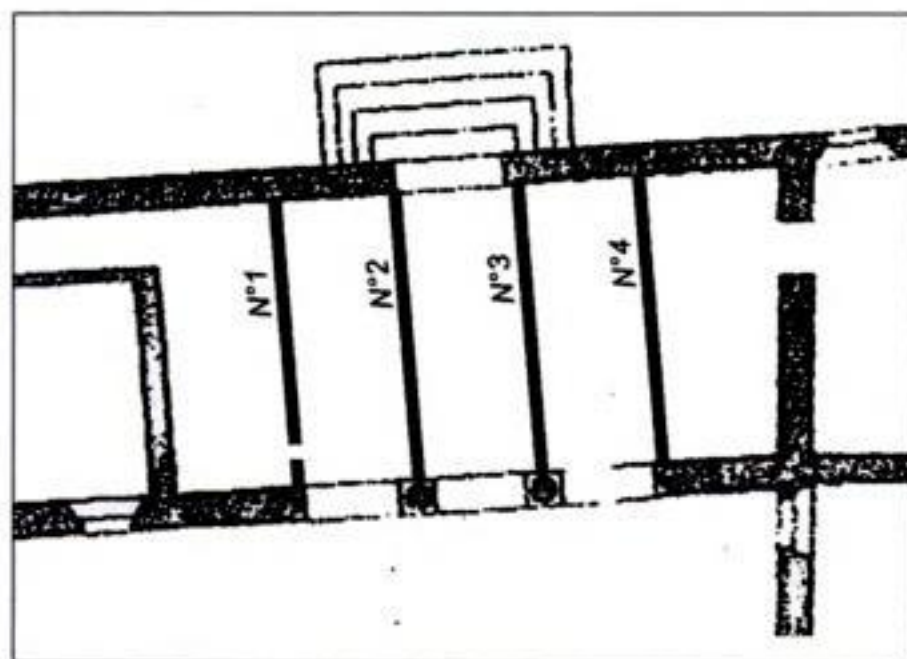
Plan of the pavilion vault arcade showing the four tie beams.
